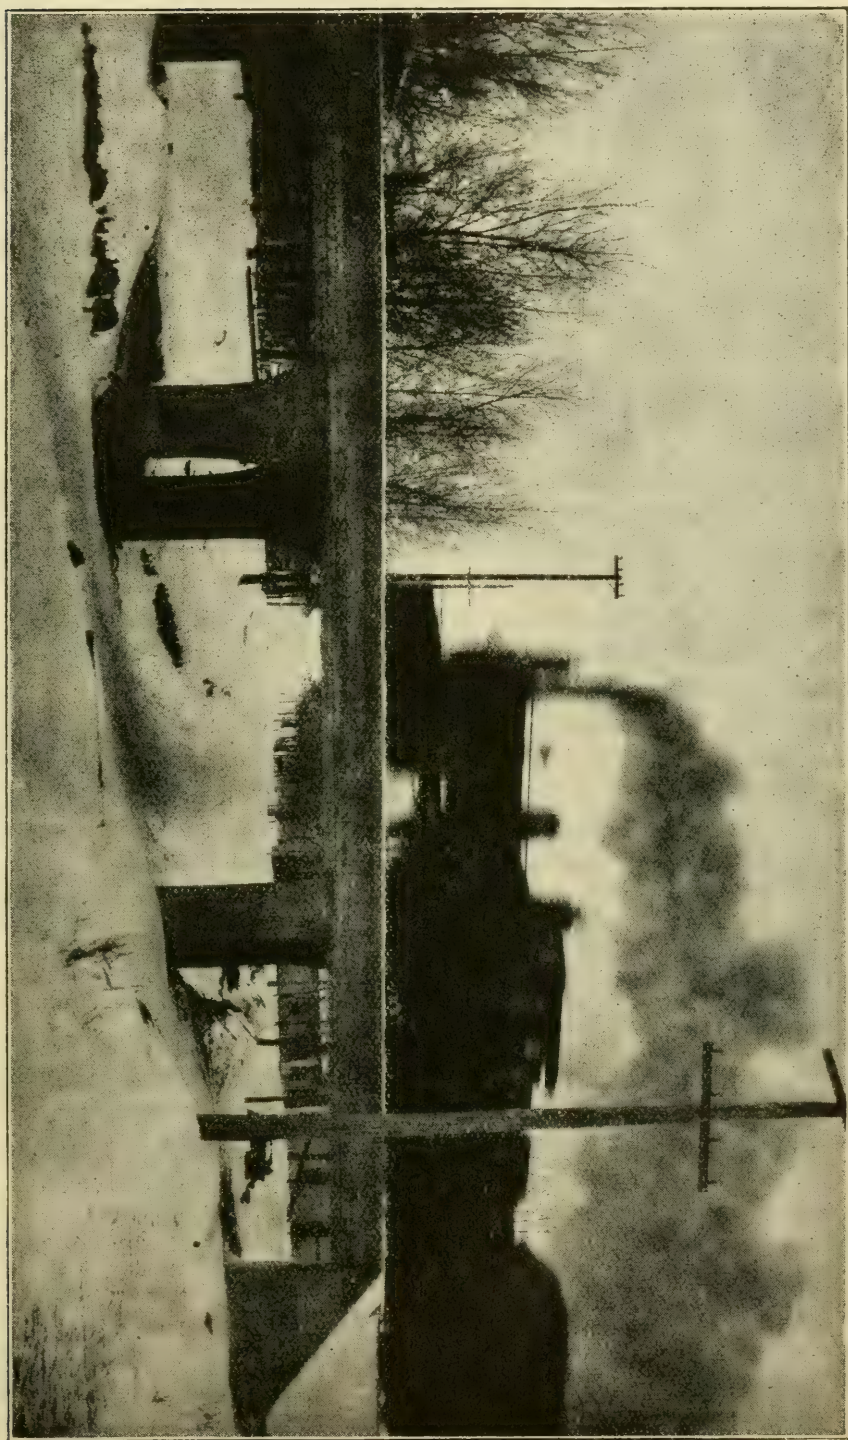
SOO LINE RAILROAD BRIDGE OVER WILSON STREET, AMHERST, WIS.
